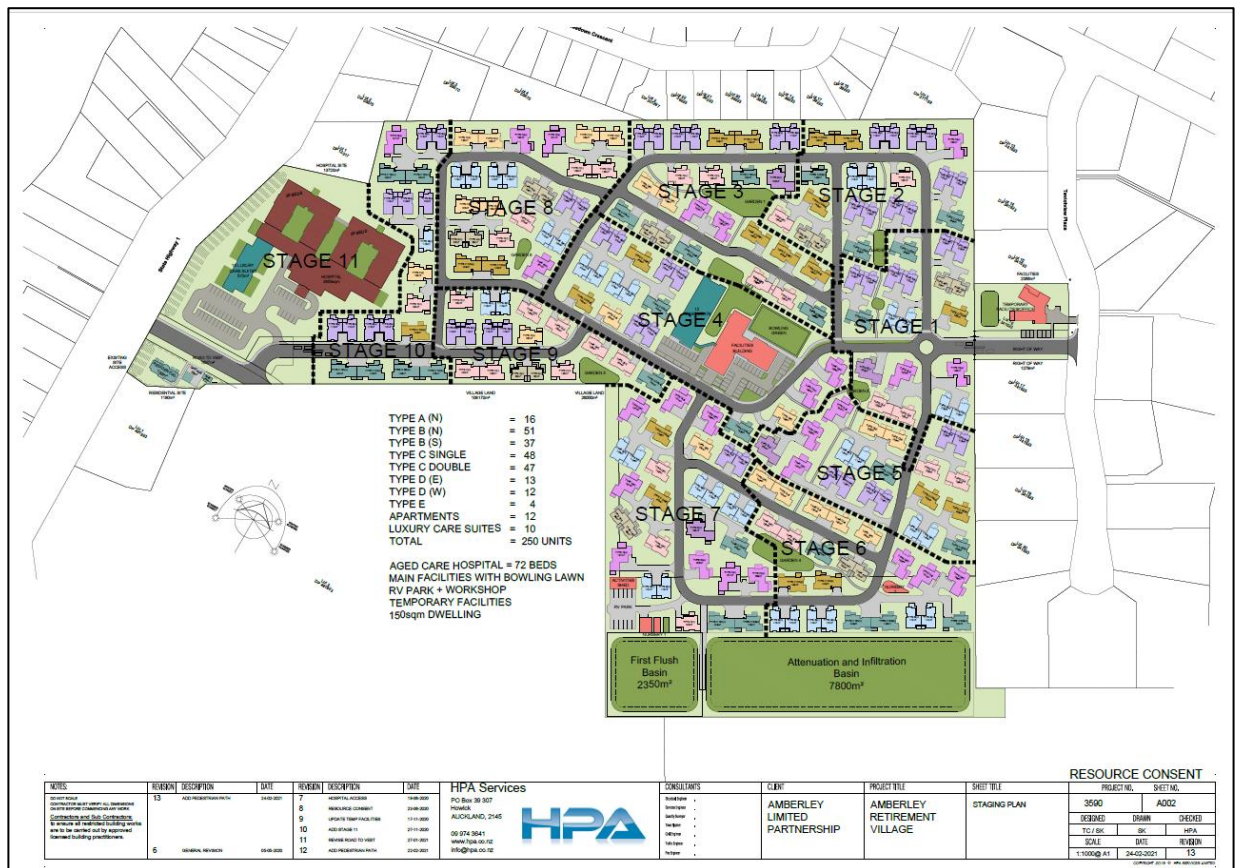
Site and staging plan for retirement village on adjoining land to the north
